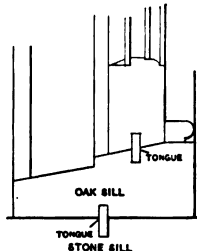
Arrangement for Keeping Rain from Driving in Between Oak Sill and Lower Rail of Sash.
